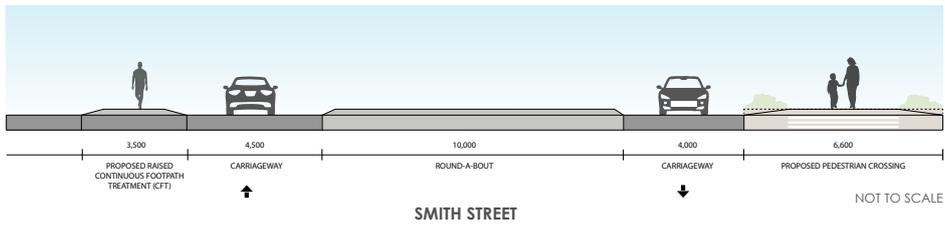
Section K-K: Route 5 | Smith Street at Edward Street, looking west
